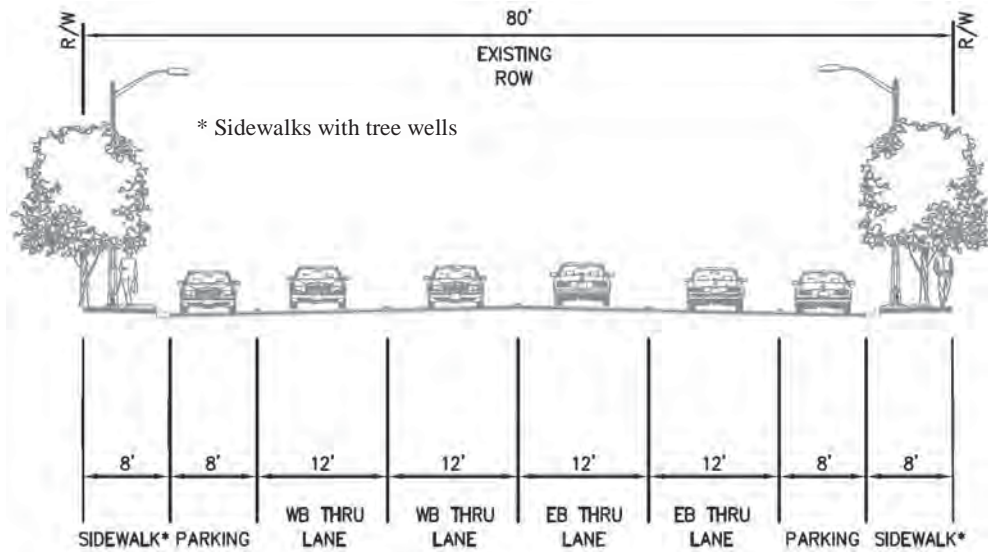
Proposed Cross Section, E Street Between 3rd Avenue and Broadway
